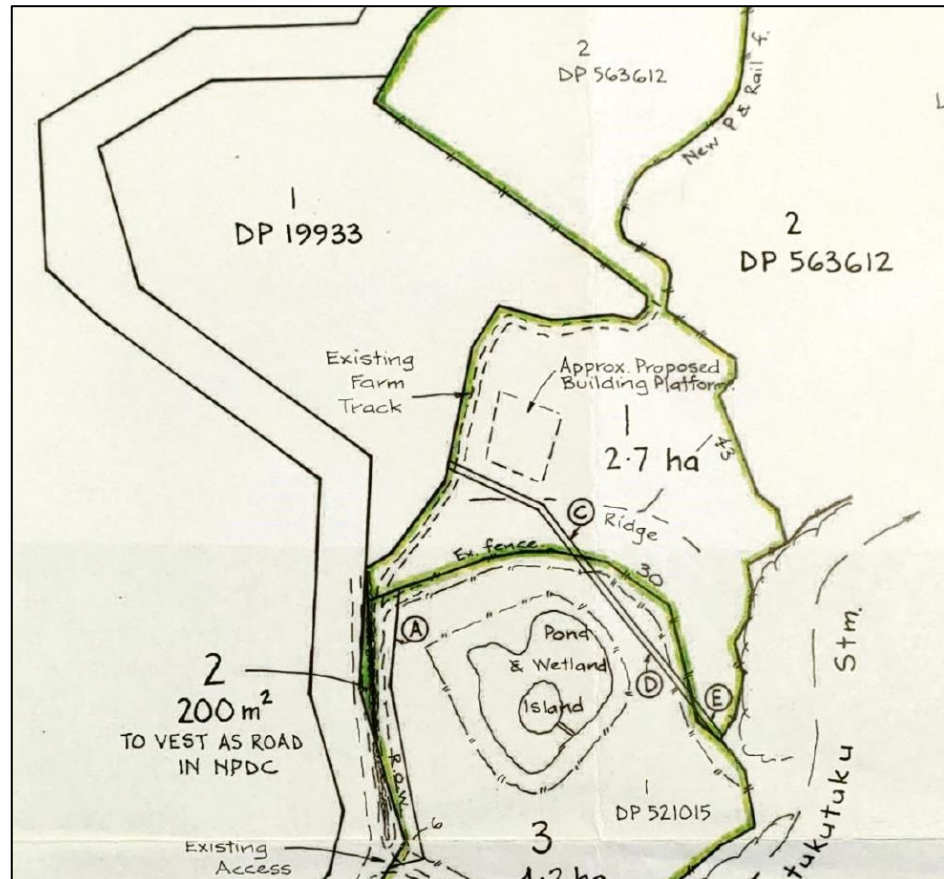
Excerpt from Rev 1 Scheme Plan Dated July 2022 showing building platform
